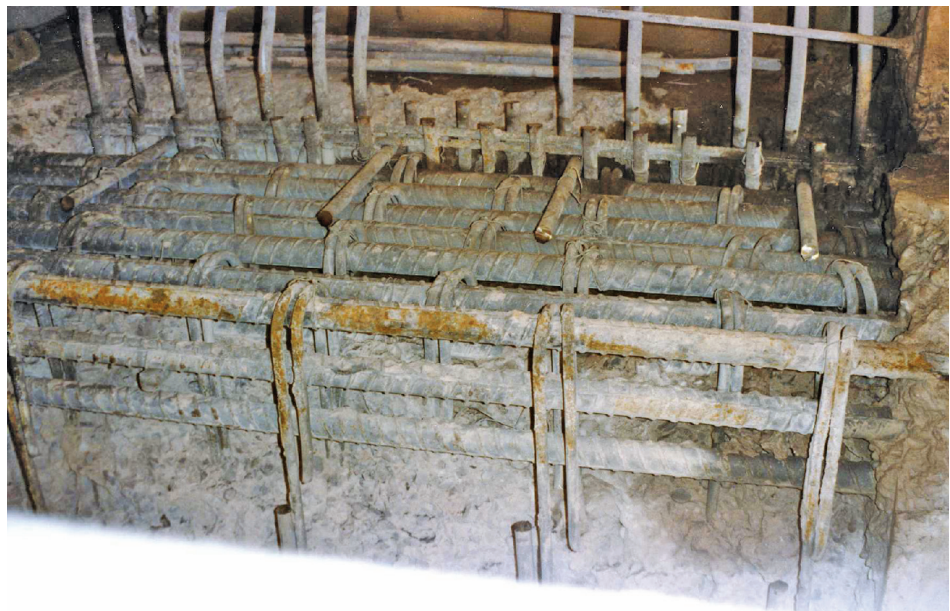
Panel wall vertical reinforcement cranked into position originally
